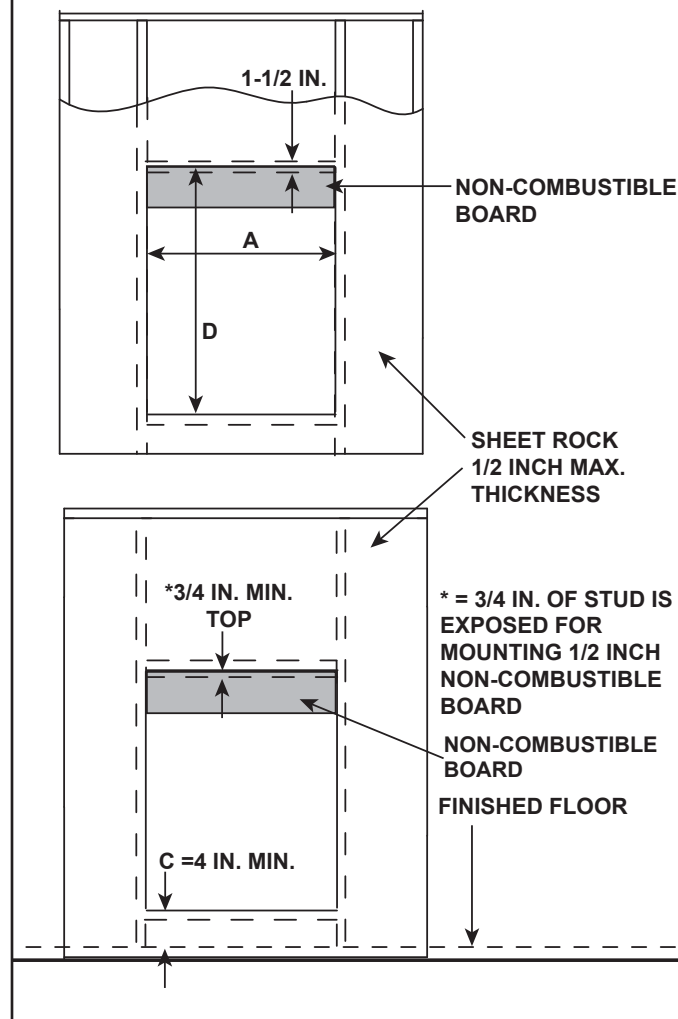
In-Wall Tub Installation - Sheet Rock Facing
